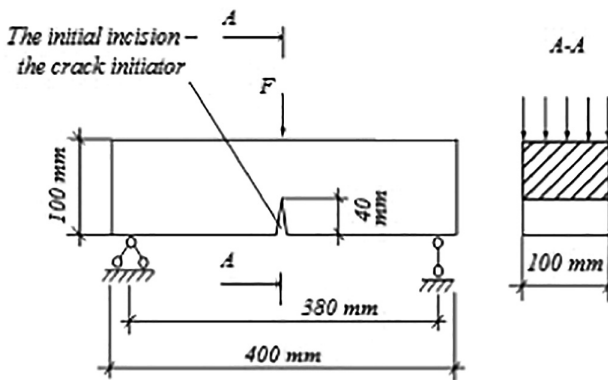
Arrangement of flexural tests with crack opening mode for the prismatic specimen
